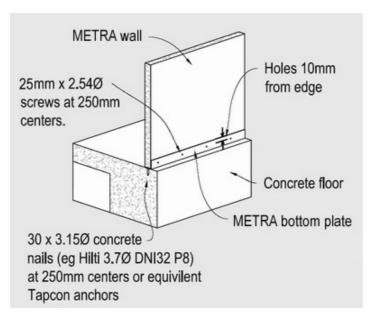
External Wall/Floor Fixing - Concrete Floor
